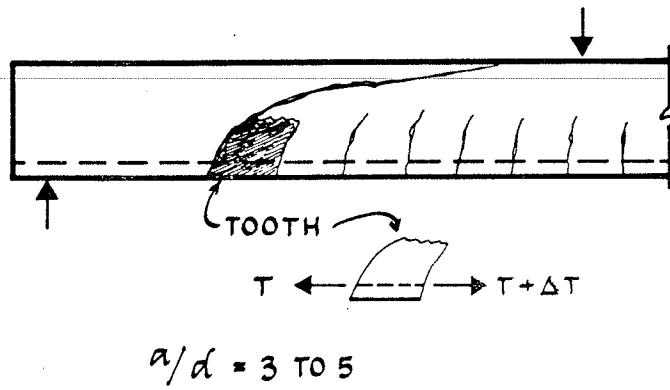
TOOTH CRACKING FAILURE AND DIAGONAL TENSION FAILURE
